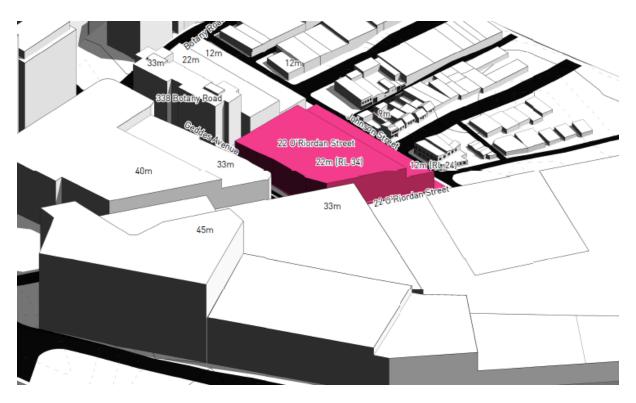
Isometric view of proposed building envelope - looking south-east along O'Riordan Street
